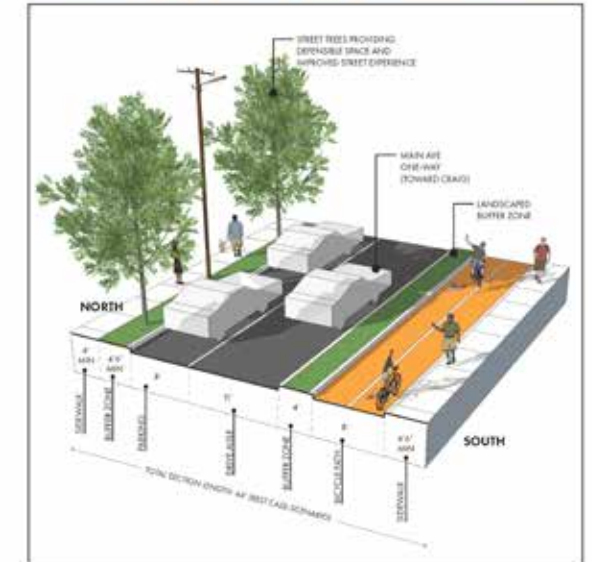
Main Avenue Improve Existing Conditions Concept as presented in the Craig-Main Connection Complete Streets Study.
